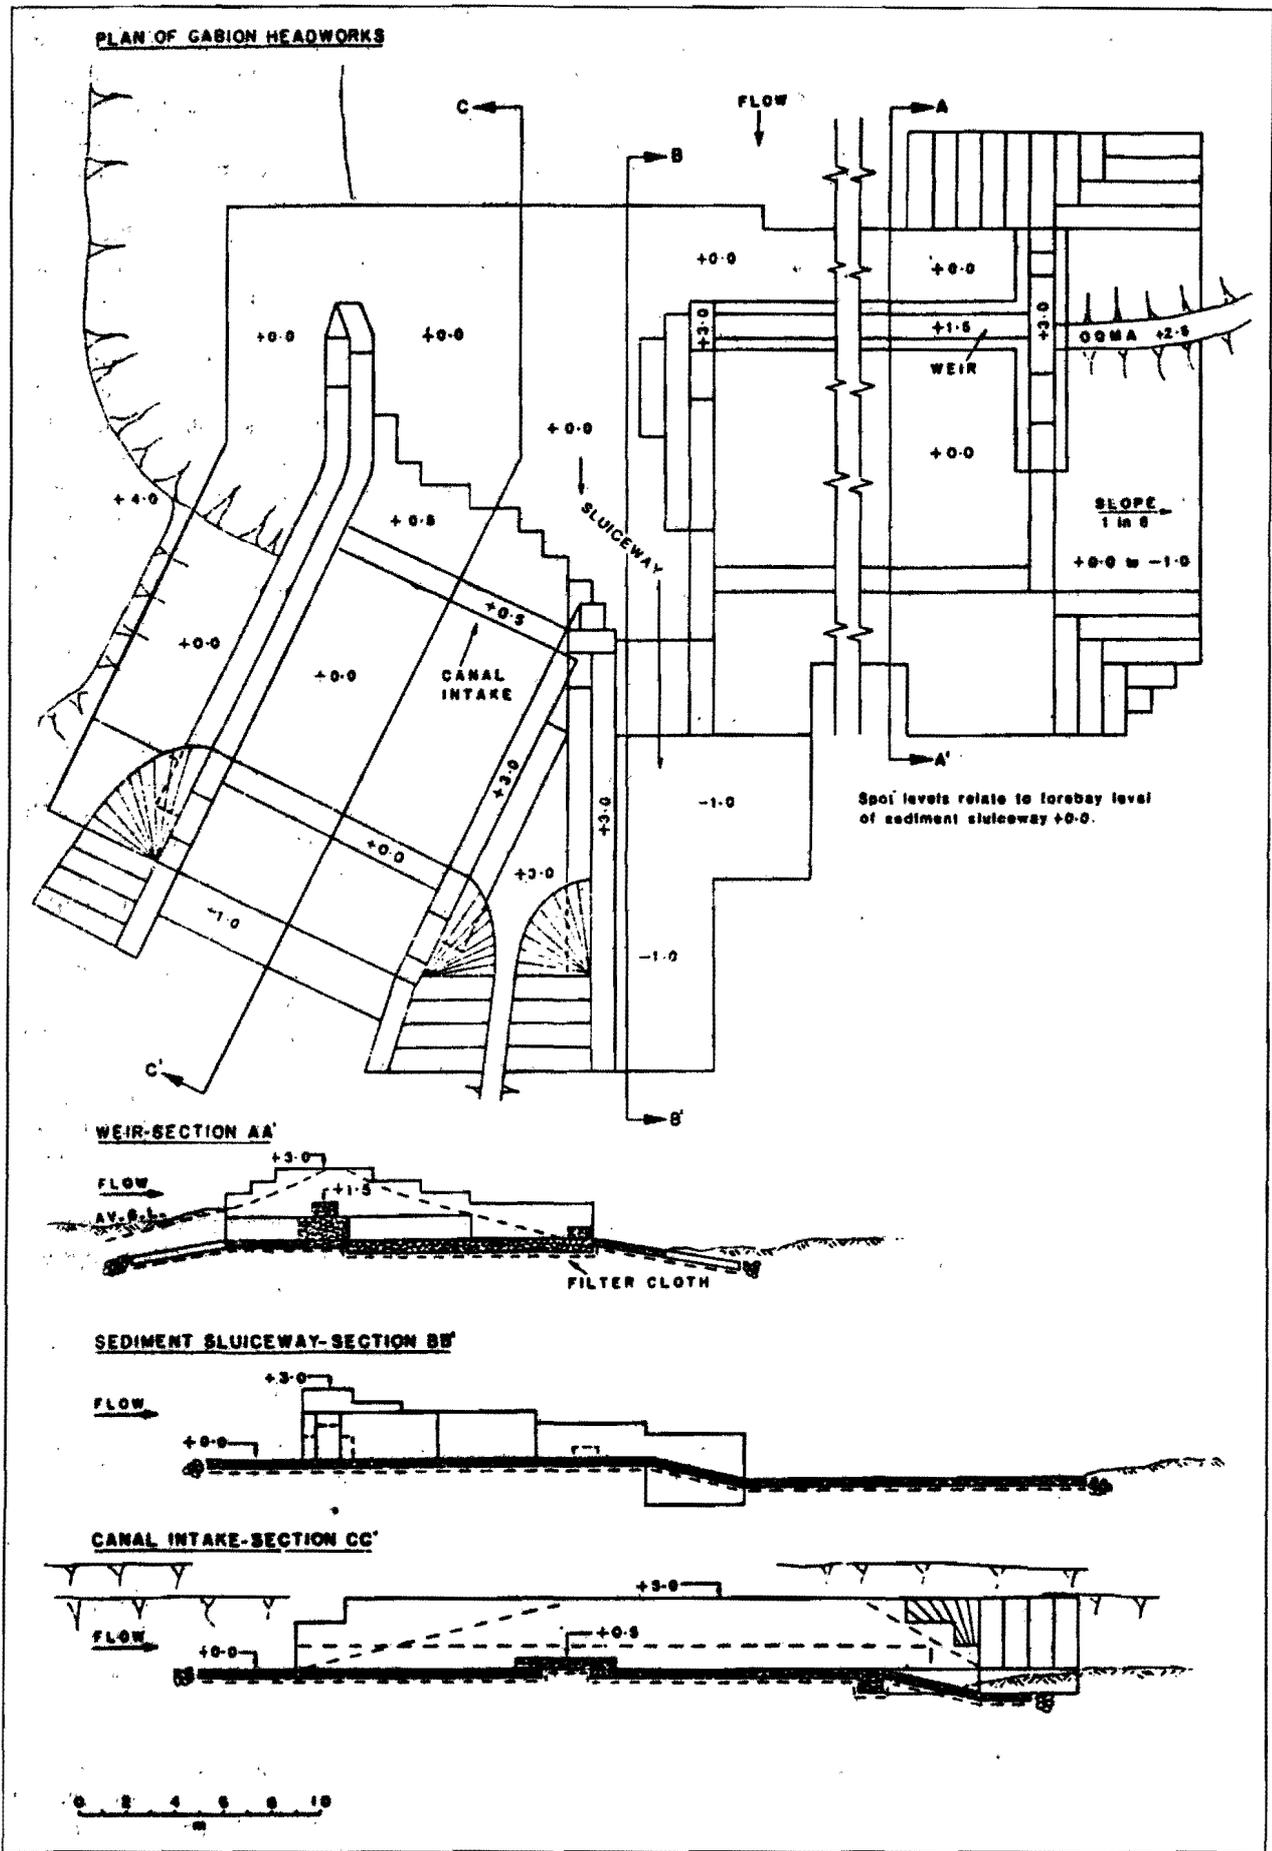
Sketch of proposed improvements to traditional diversion weir by gabions
